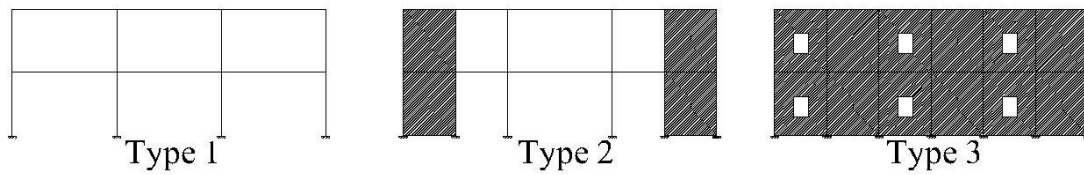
Frames with only (RC) columns (Type 1), with RC columns and Shear Walls (Type 2), only with Shear Wall (Type 3) side views
